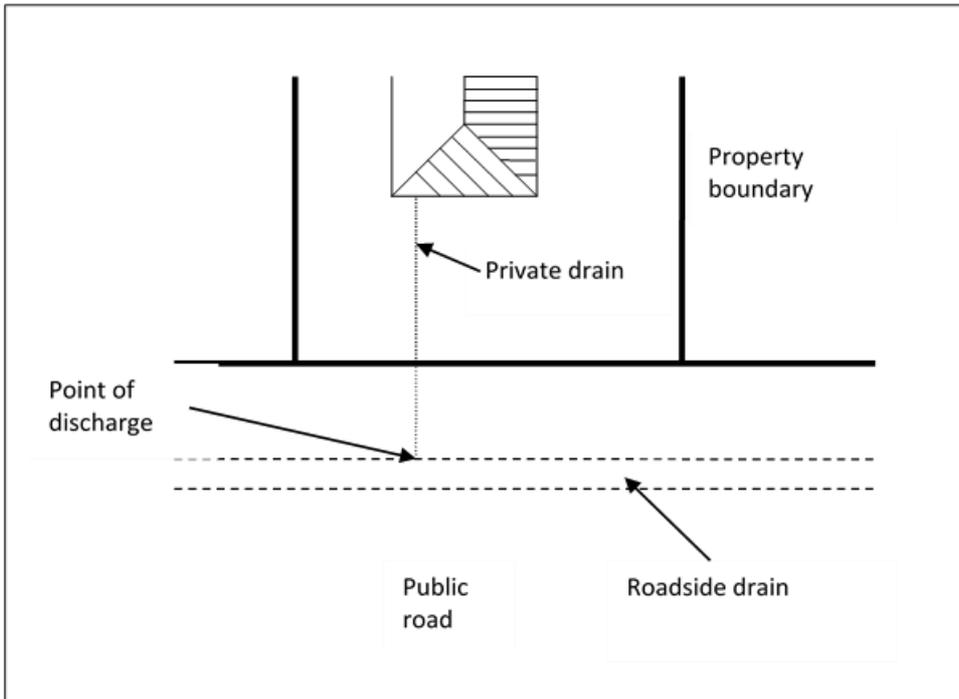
Point of Discharge Location - With Street Frontage To Roadside Drain
